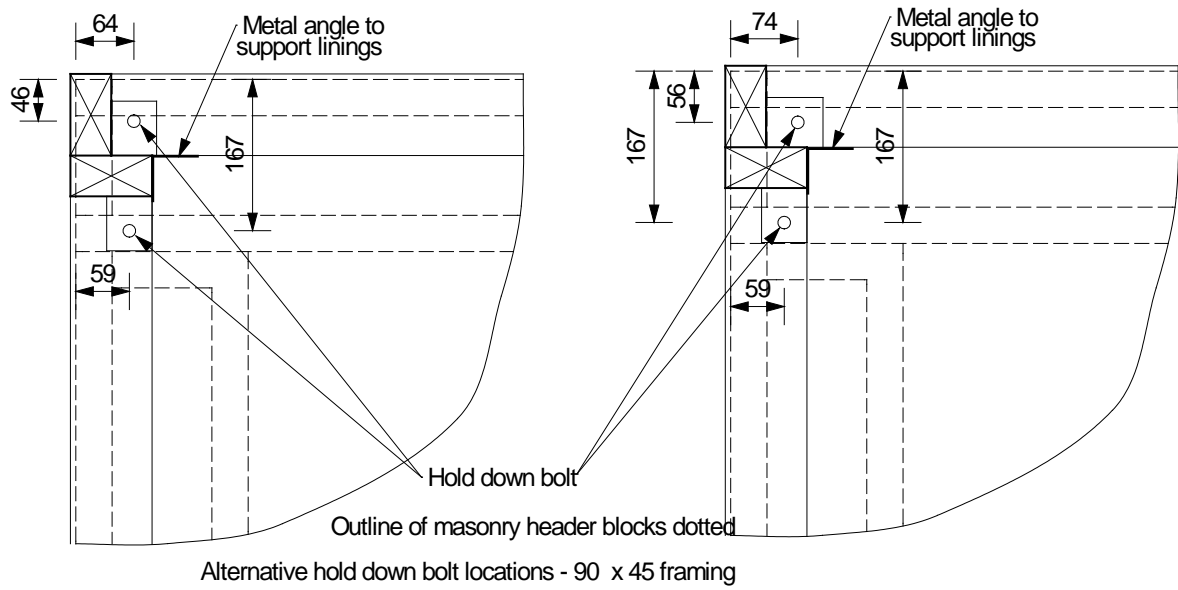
Layout of reduced wall framing at a foundation corner showing hold-down bolt locations – note that the upper hold-down bracket is either fixed to the stud in the lower wall (left diagram) or the stud in the upper wall (right diagram).
